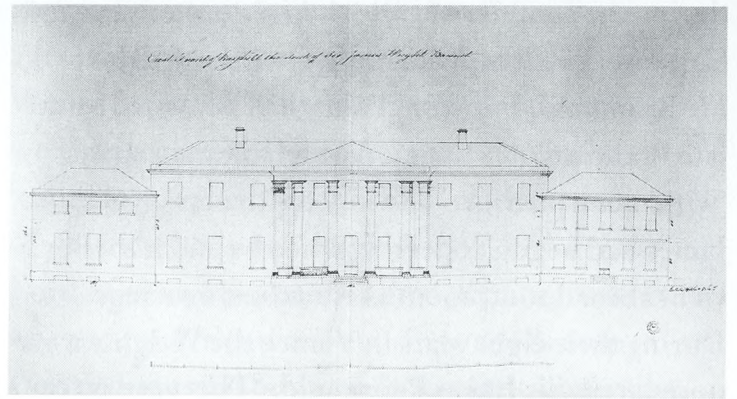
Robert Adam, proposed east elevation of Ray Hall, c.1773. *Sir John Soane's Museum.
